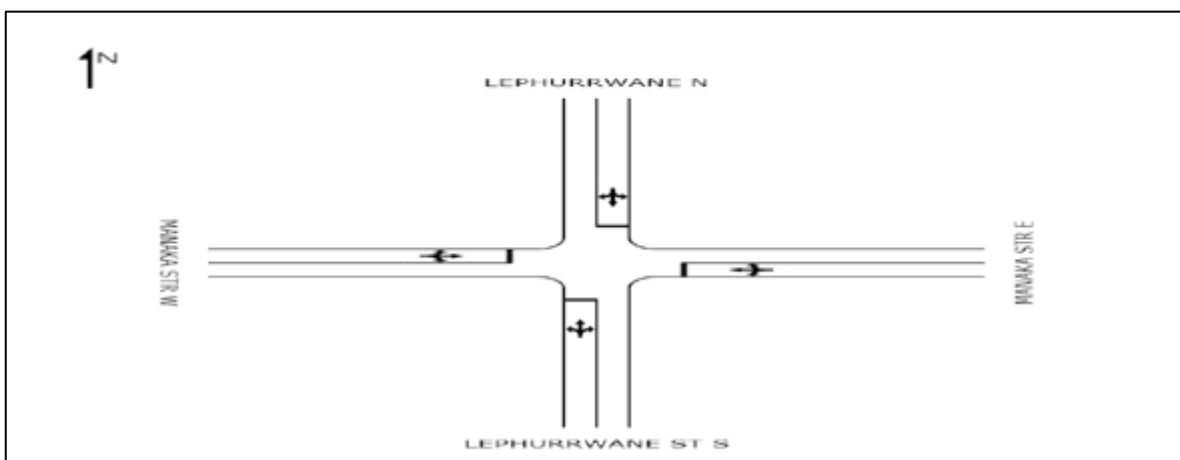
Lephurrwane Rd & Manaka Street- Existing intersection A Layout
